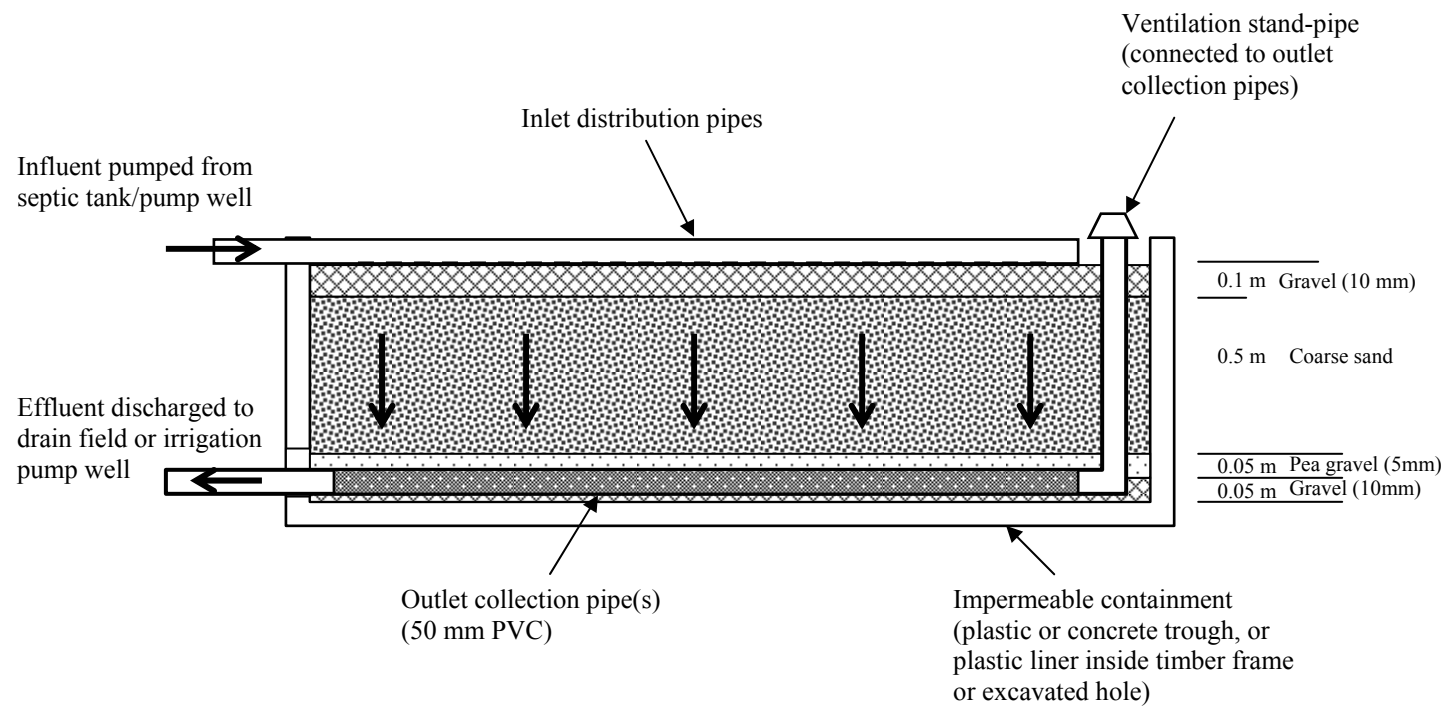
Lateral cross-sectional profile of typical on-site single-pass sand filter system.
